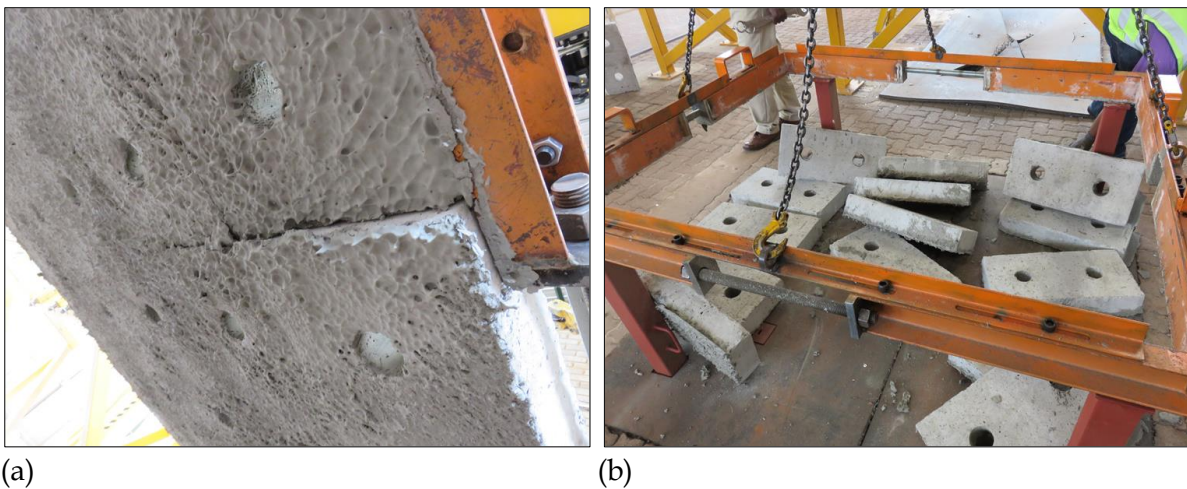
Failure of the blocks during the first test with product A. a) Shear failure along the block joint interface while the clamping stress was reduced. b) Collapse of the assembly of blocks while the rig was still being removed.
